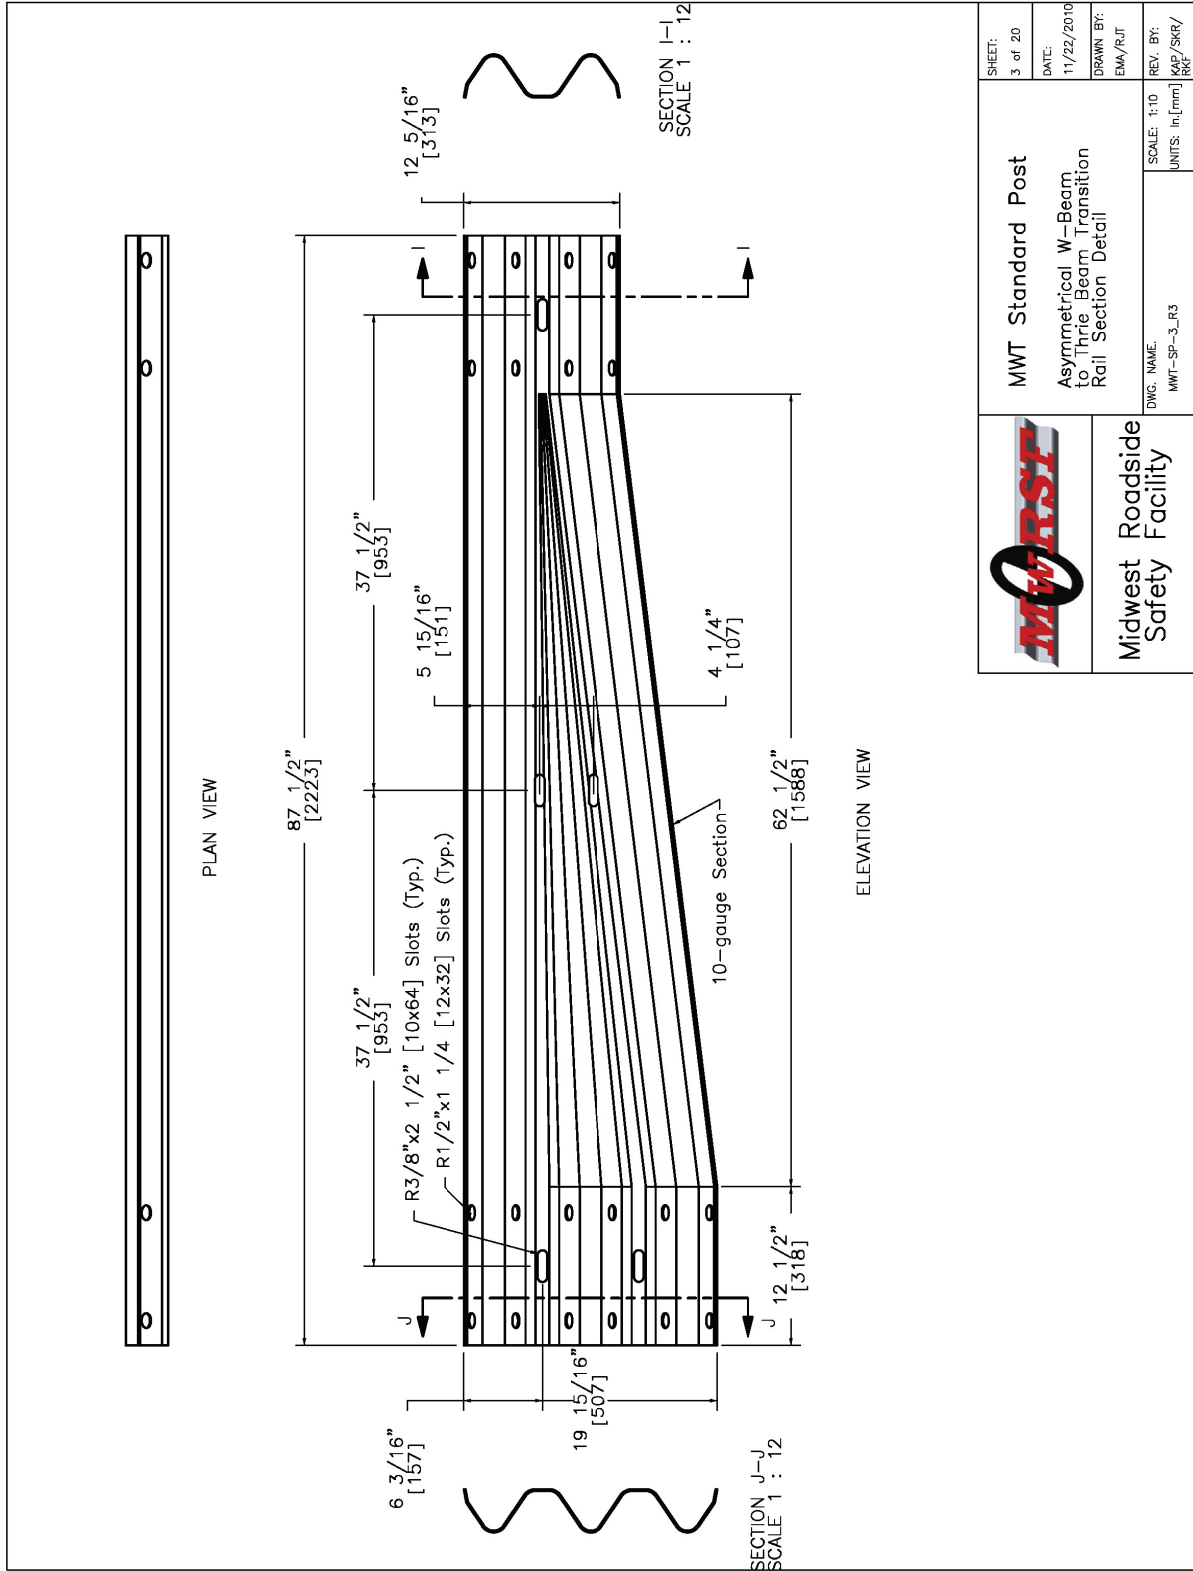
Asymmetrical W-Beam to Thrie Beam Element Details, Test Nos. MWTSP-1 through 3
